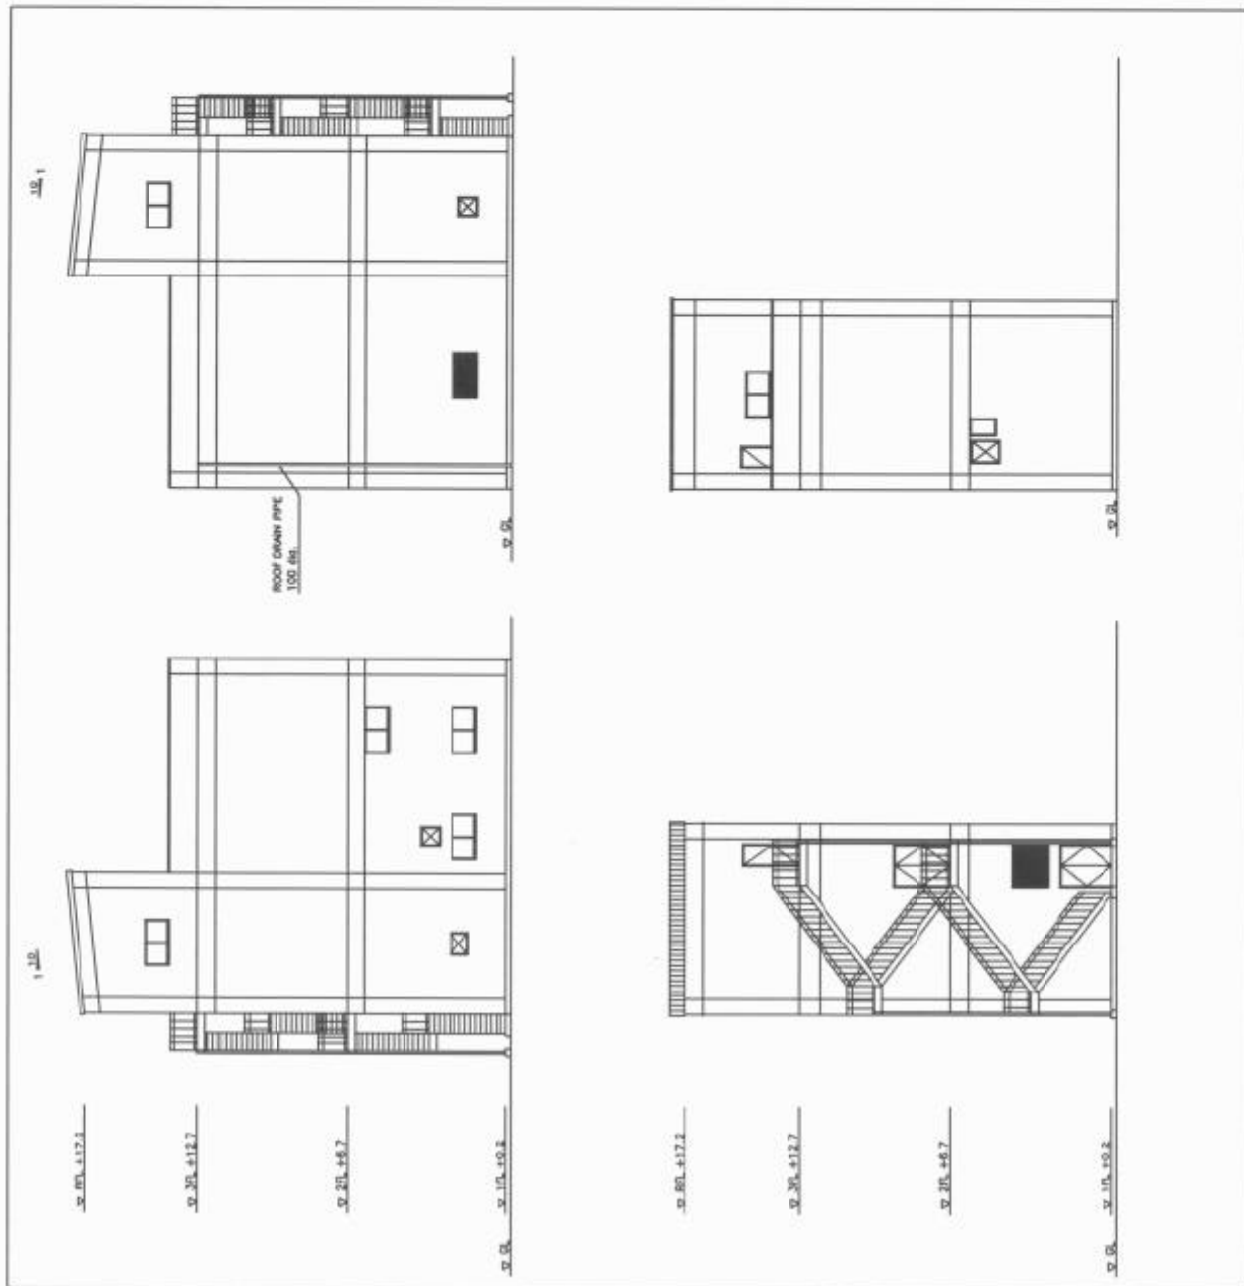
Elevation of Ice-Making Facility Building
